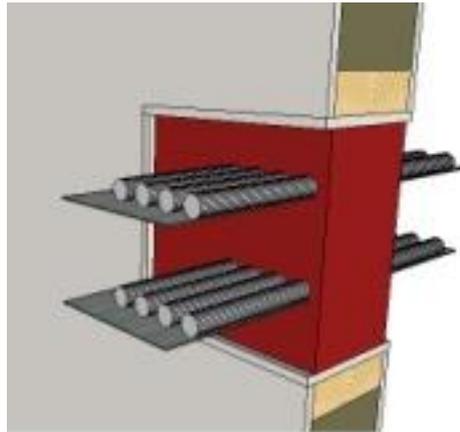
Proper detailing in timber structures is necessary to ensure that the fire resistance of structures is maintained. Fire stops are needed for joints, penetrations and installations.
